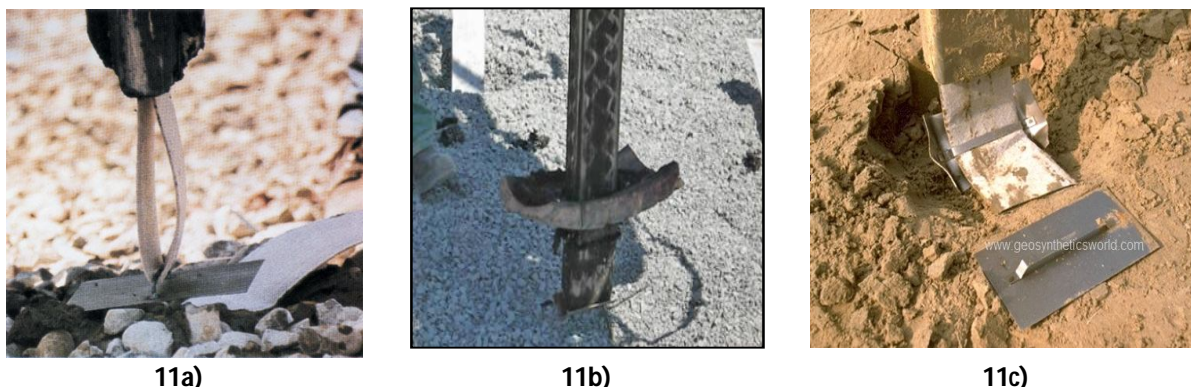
Steel hollow mandrel where the band is placed, and anchor steel plate
